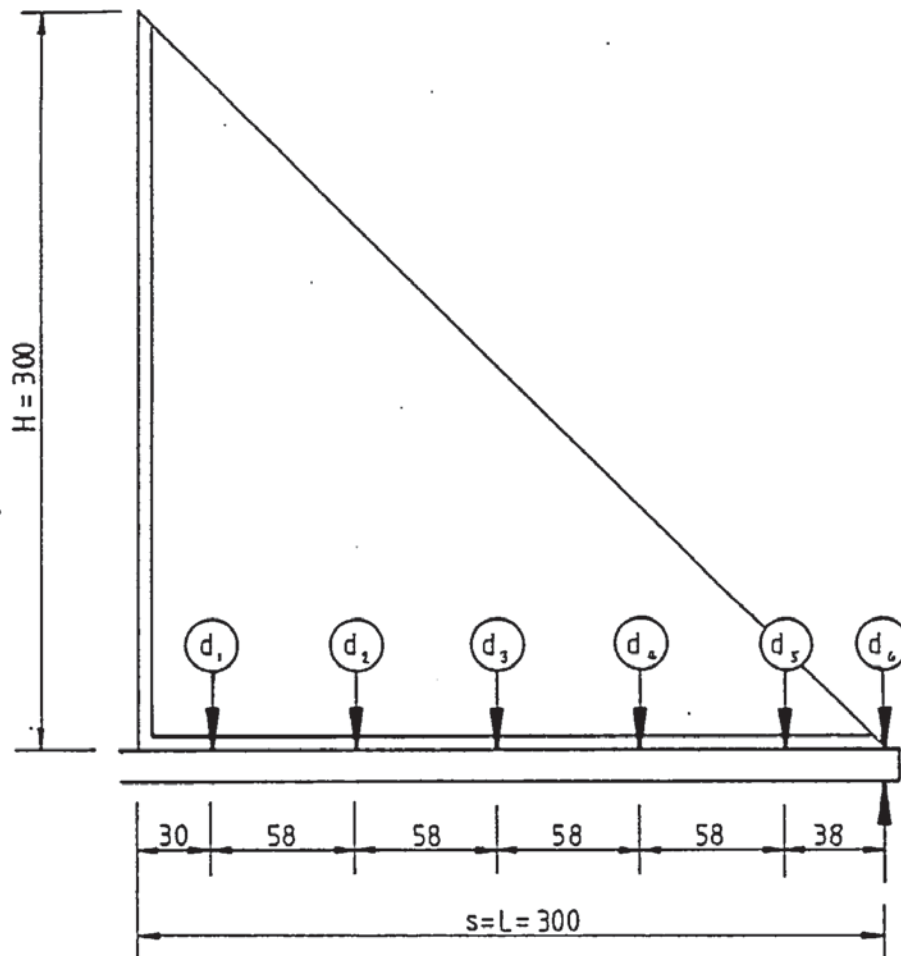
Extra dial gauge positions on loaded plate of specimen S7-6-300-1.
